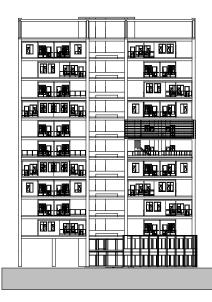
Apartment west elevation Source: Author (2021)
